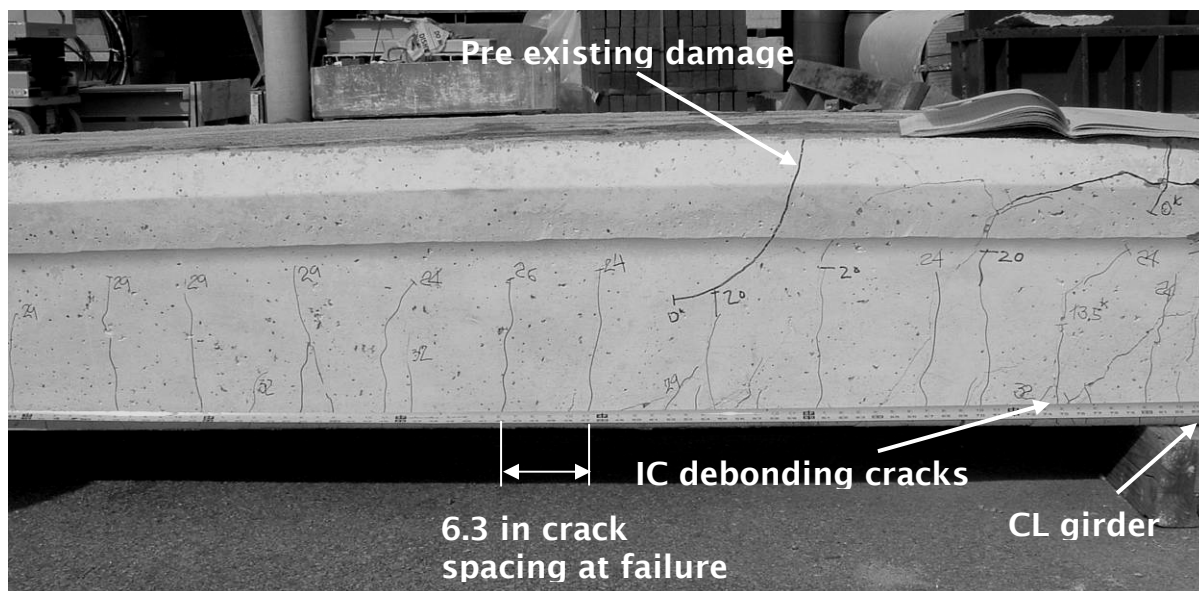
NSM bars strengthened girder NSM1S showing crack profile around midspan
